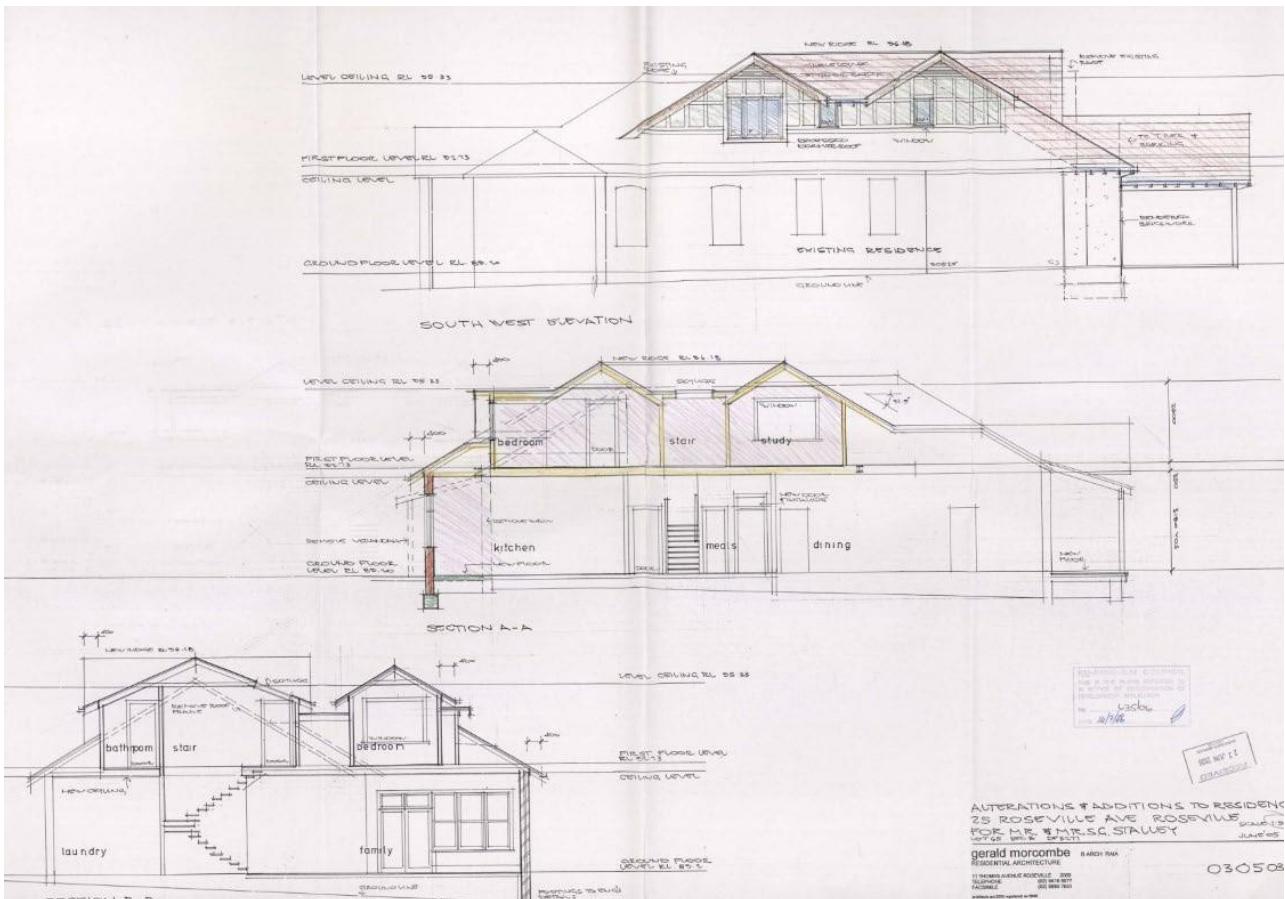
Proposed Sections for unconstructed first storey addition to the dwelling dating from 2009
